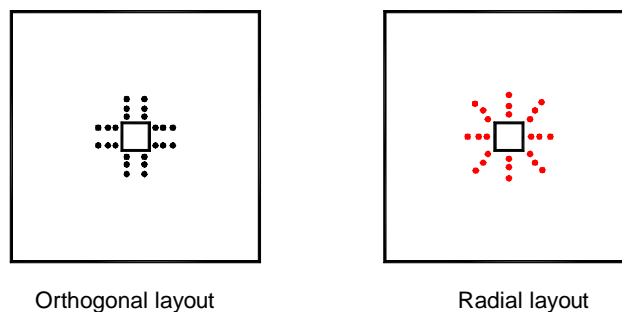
Layout pattern of shear bolts in the concrete slab
